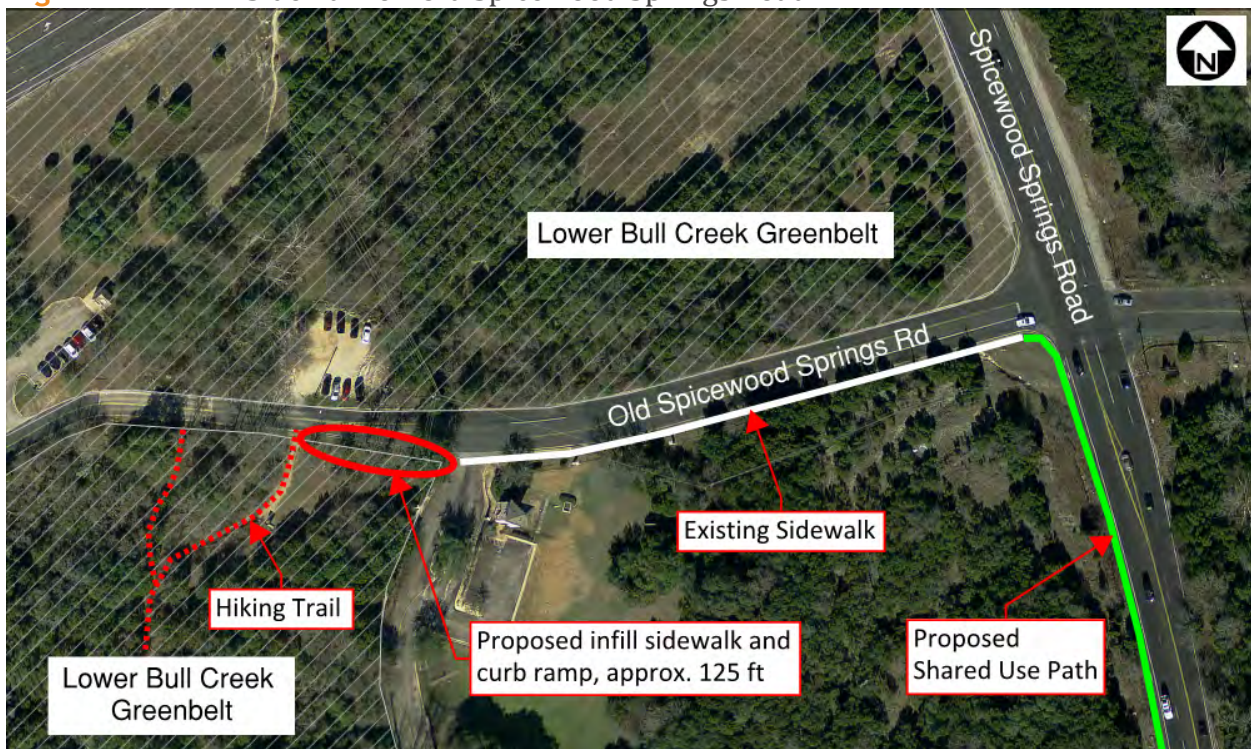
Infill Sidewalk on Old Spicewood Springs Road
